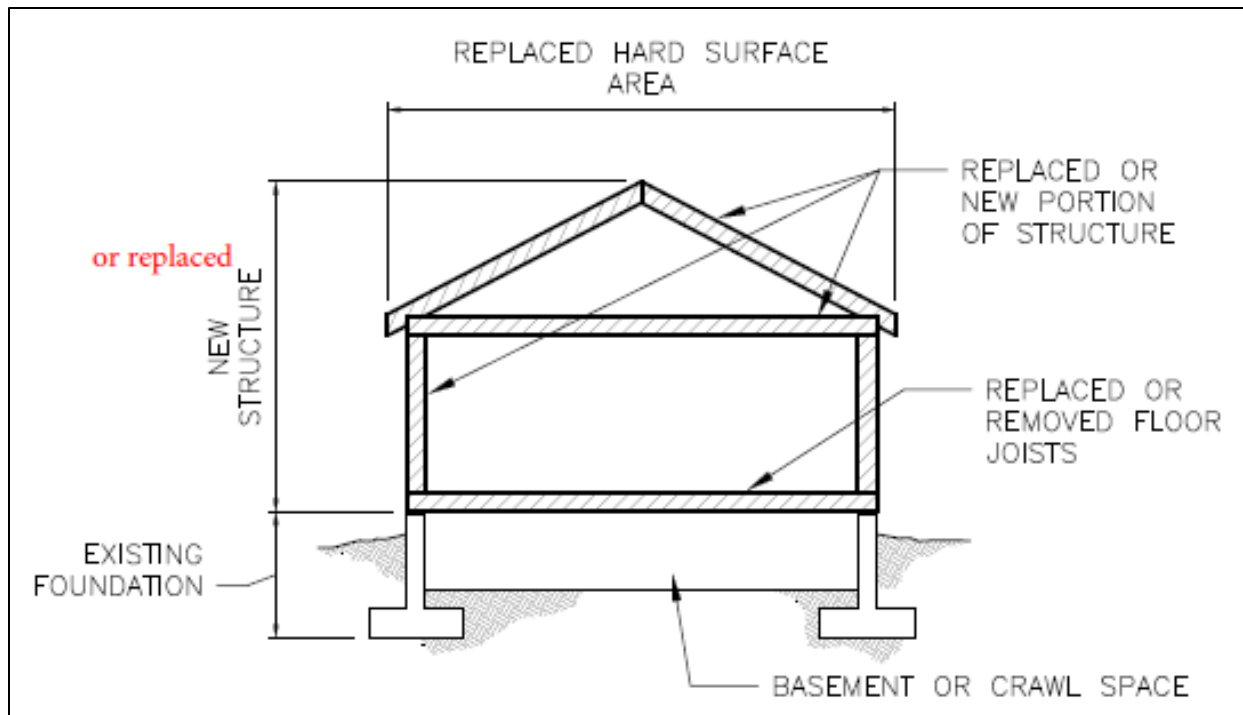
Example of Replaced Hard Surface – Flow Joists Removed or Replaced. (New Figure)
